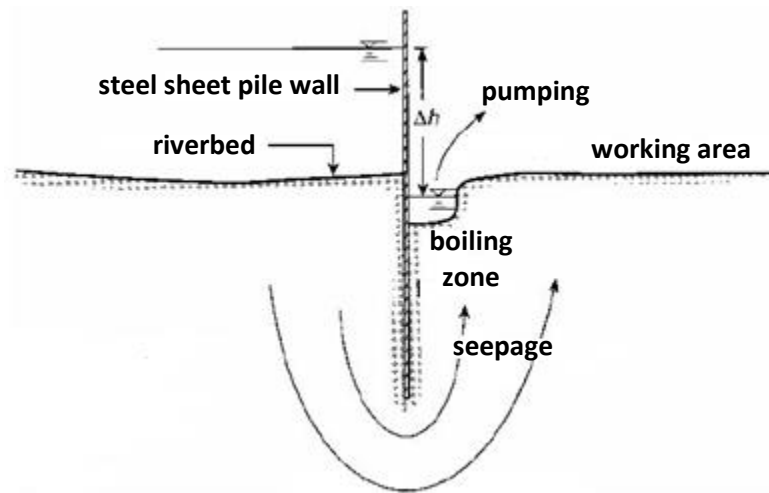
Sheet pile cofferdam and piping phenomenon
